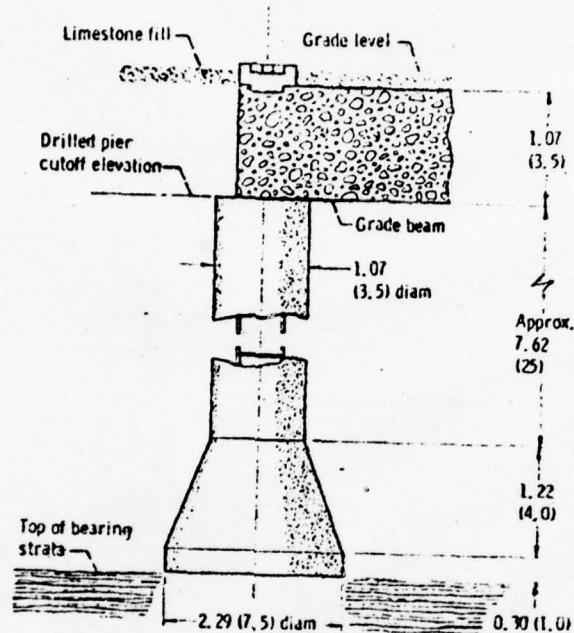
ELEVATION OF TYPICAL PIER AND GRADE BEAM
